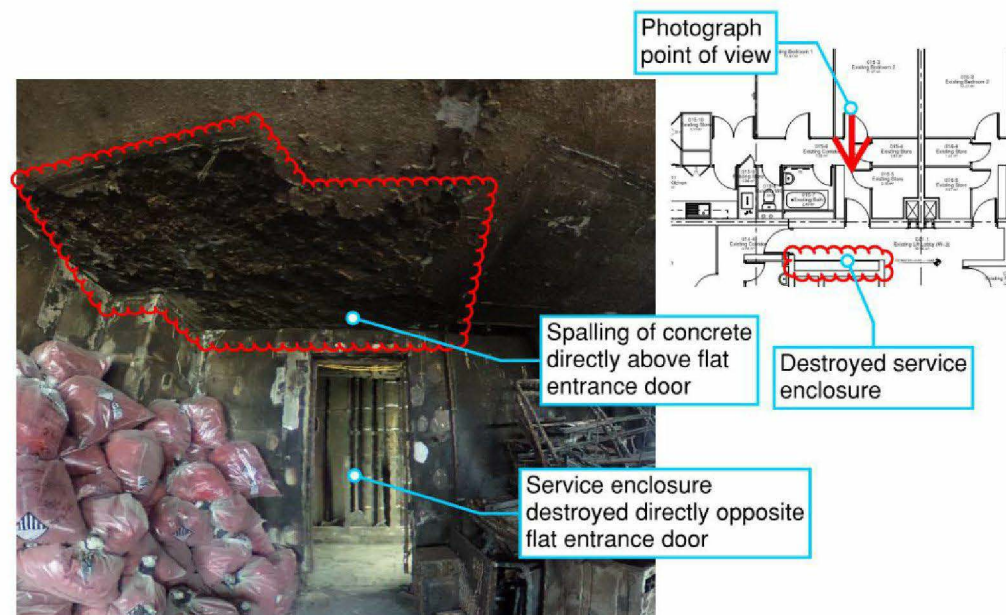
Example of damage around entrance door to Flat 175 on Level 20 (post-fire inspection, 08/11/17)
